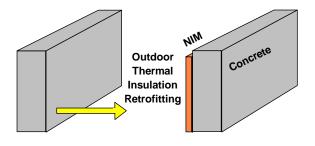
Outdoor thermal insulation retrofitting of concrete with NIMs.
